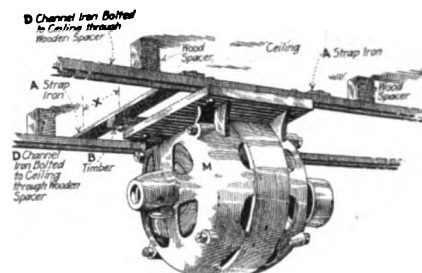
Method of mounting motor to ceiling by using steel channels that are bolted to the ceiling through wood spacers.
